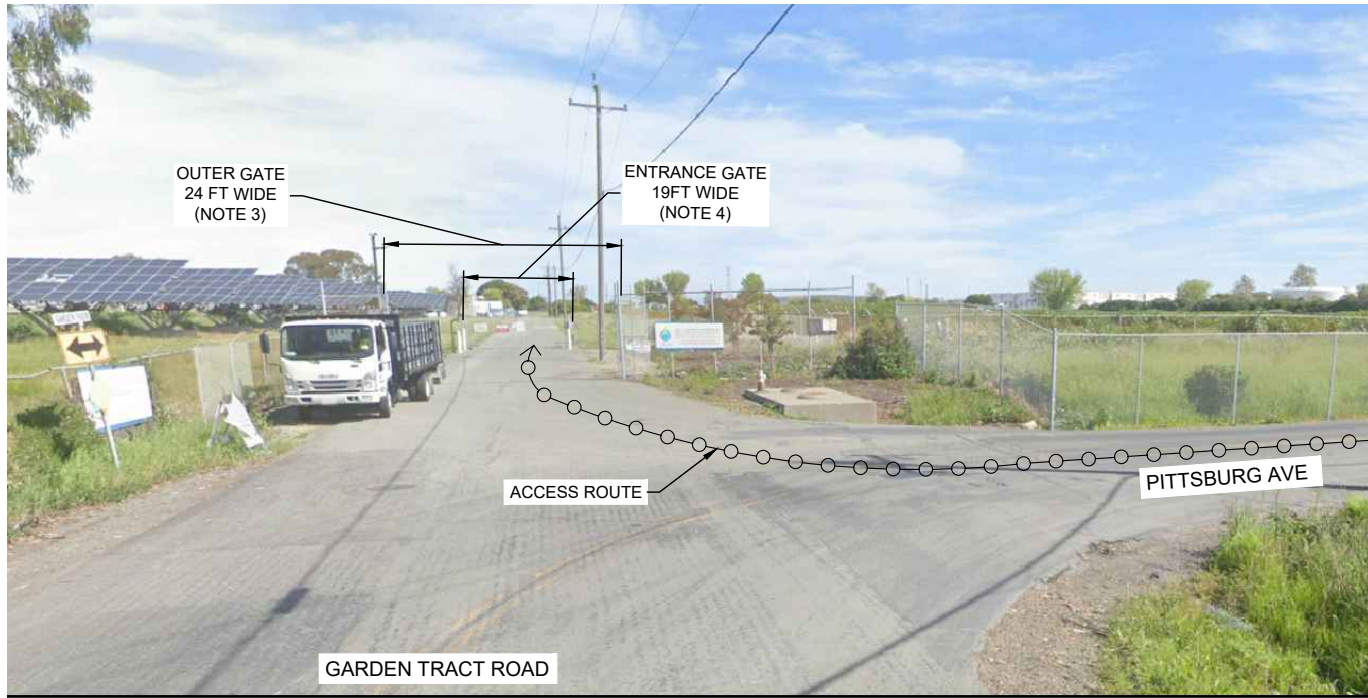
FRONT ENTRANCE AT GARDEN TRACT ROAD
